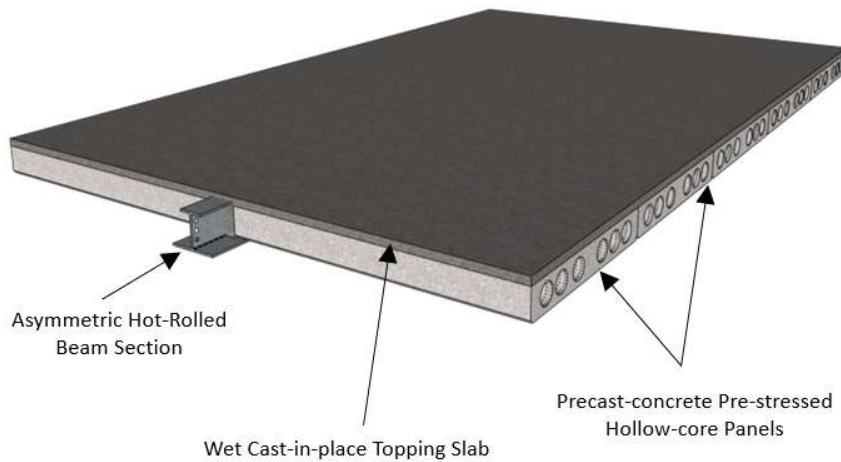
Loading scenario 2a, precast-concrete panels with a wet topping slab
